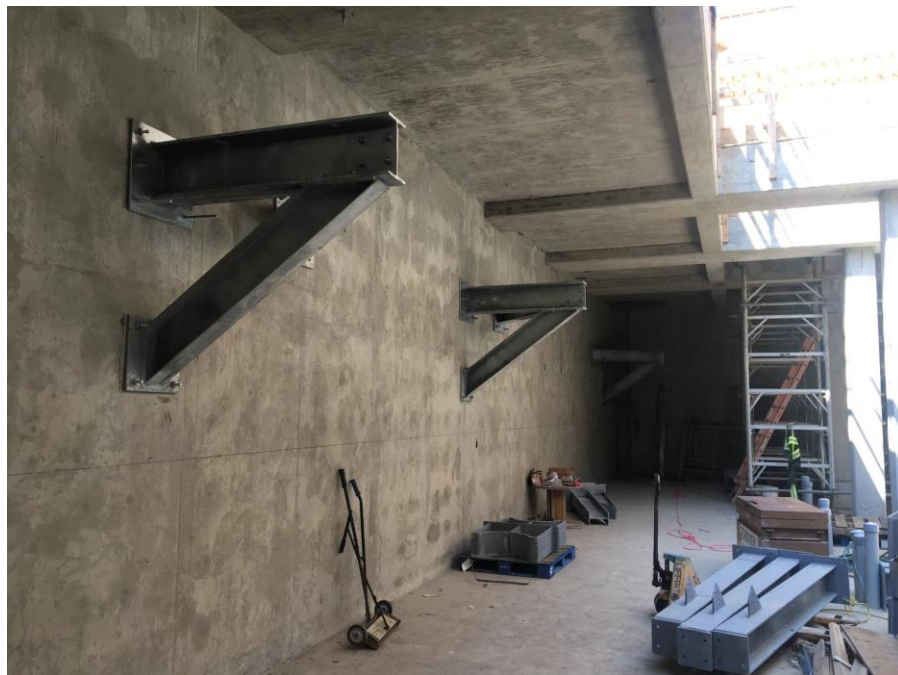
Clover Point Pump Station – Installation of pipe supports in the pump room
